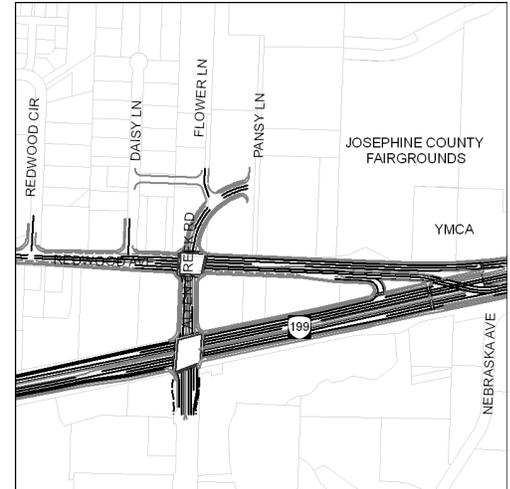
EXISTING AND PROPOSED BIKE/PEDESTRIAN FACILITIES
